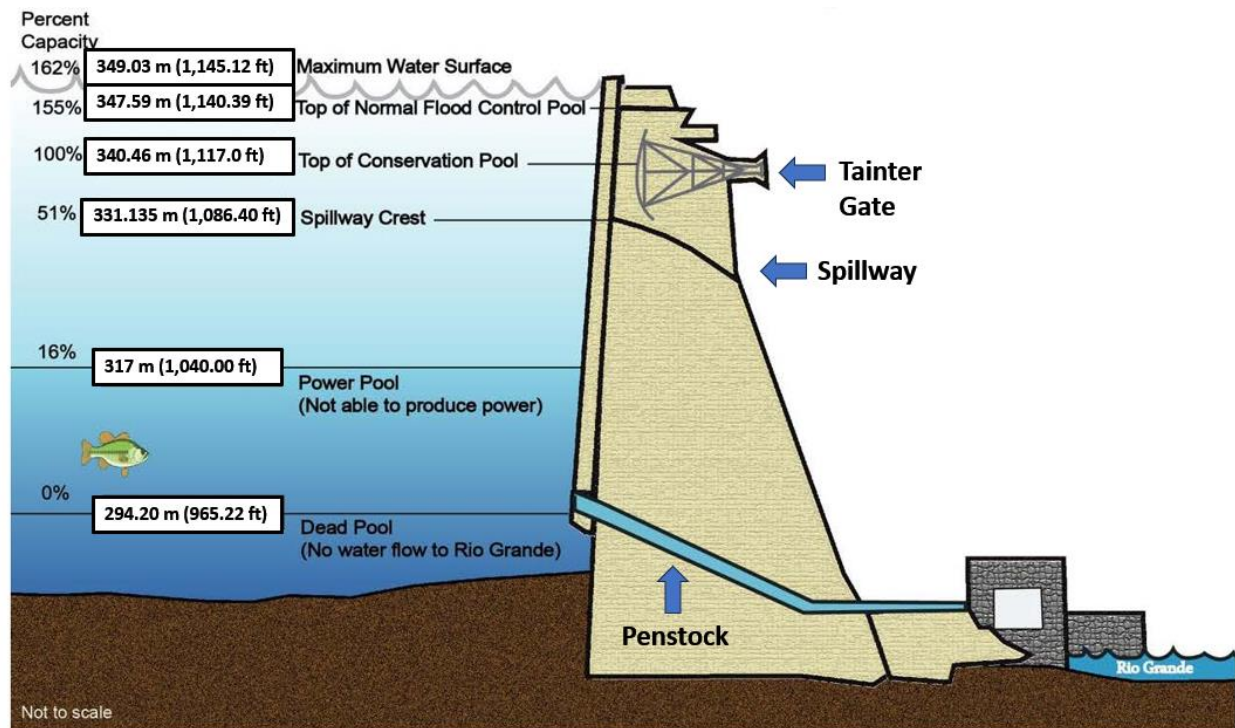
GENERAL PROFILE VIEW OF AMISTAD DAM AND CRITICAL OPERATING ELEVATIONS
